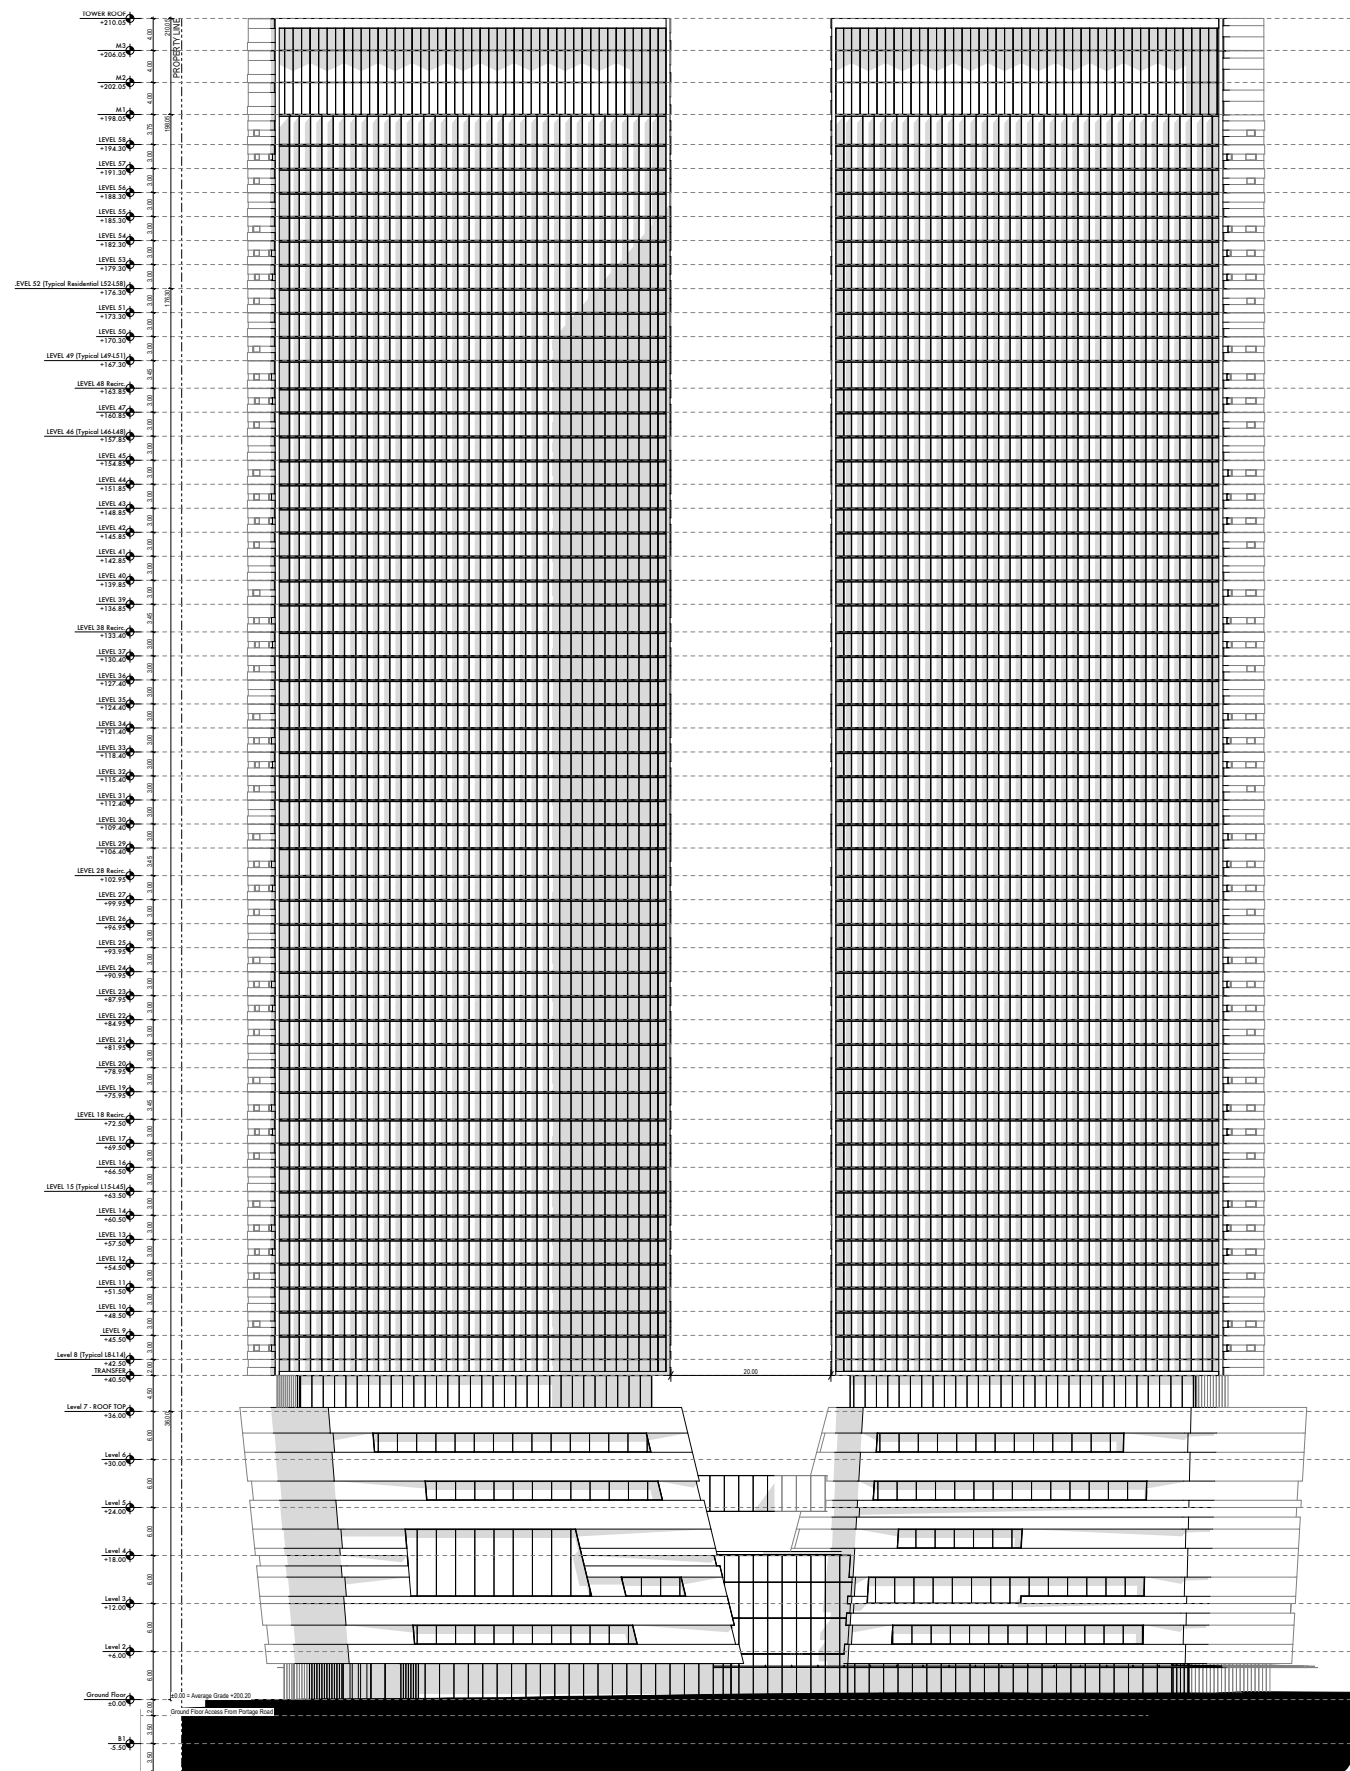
6546 Fallsview Boulevard West Elevations (Prepared by: Architects Alliance)
